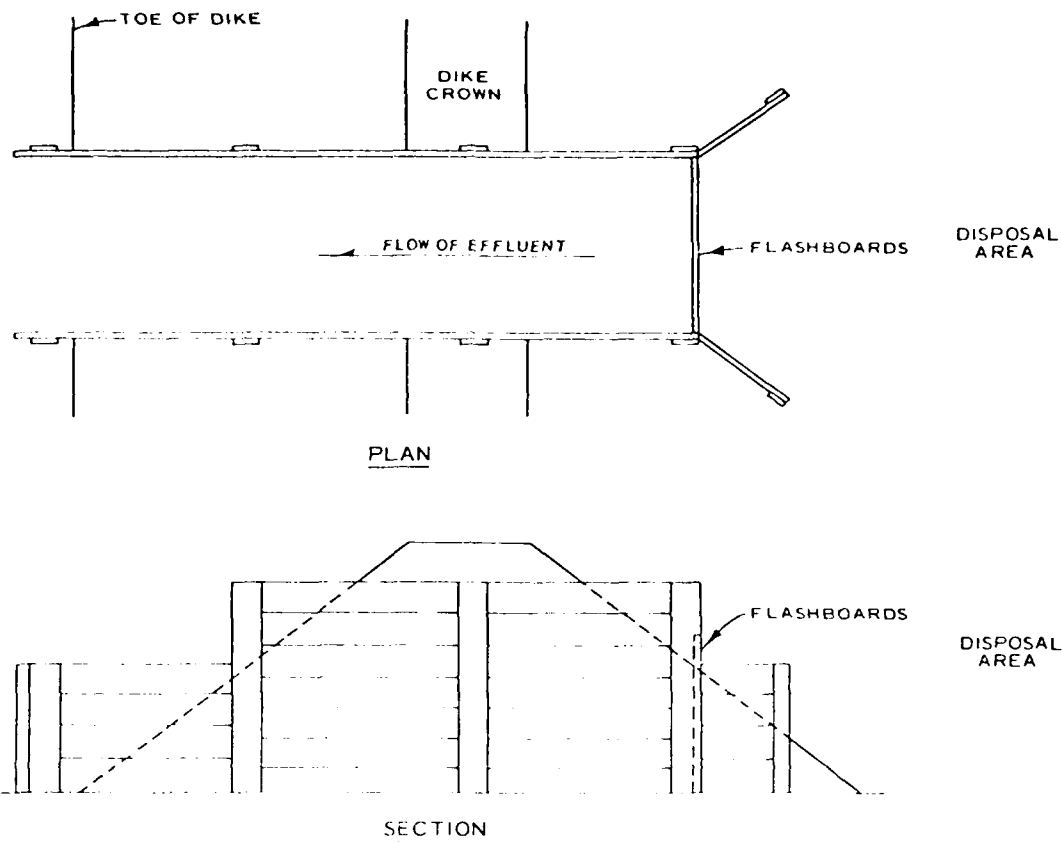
Box sluice or flume (reproduced, with modification, with permission from Hydraulic Dredging, by John Huston, Copyright 1970, by Cornell Maritime Press, Inc., Cambridge, Md.)
